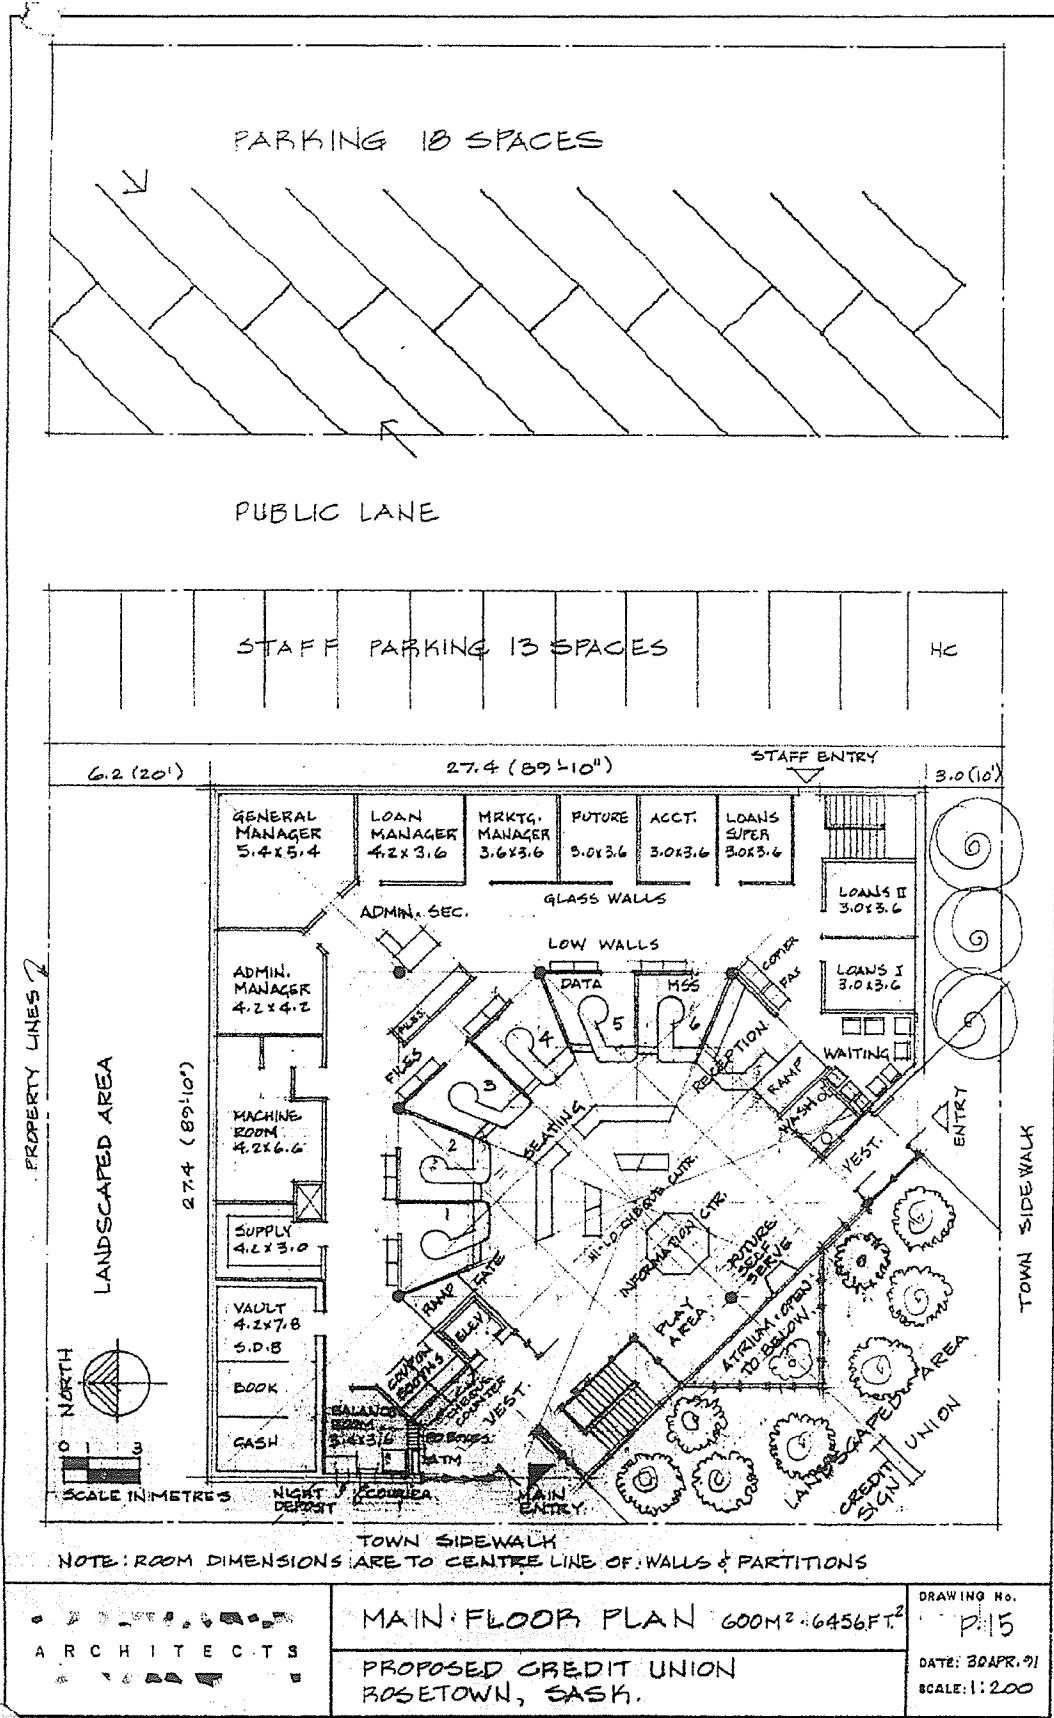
Architect design sketch 15, Main Floor Plan. Courtesy of the architect.
